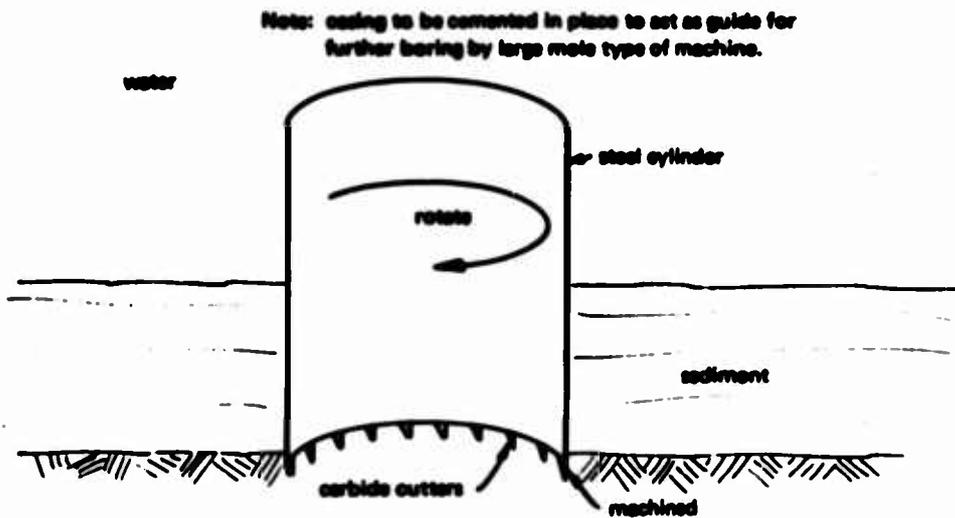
Method for using steel casing with carbide cutters for cutting through sediments to bedrock.
